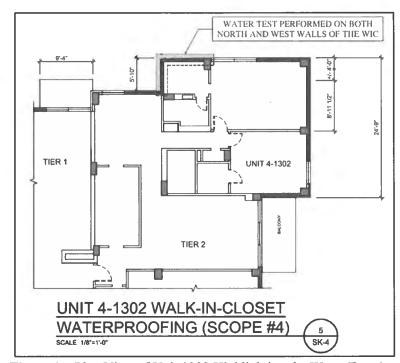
Plan View of Unit 1302 Highlighting the Water Test Area
